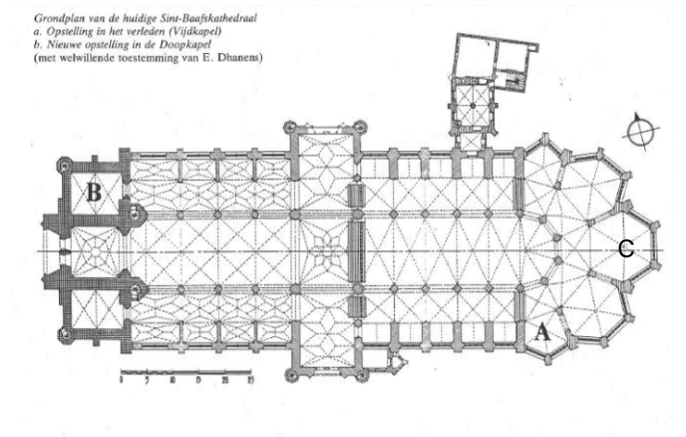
Floor plan of the Cathedral of Saint-Bavo (A) Vijdt Chapel, (B) baptistery, (C) sacrament chapel.
